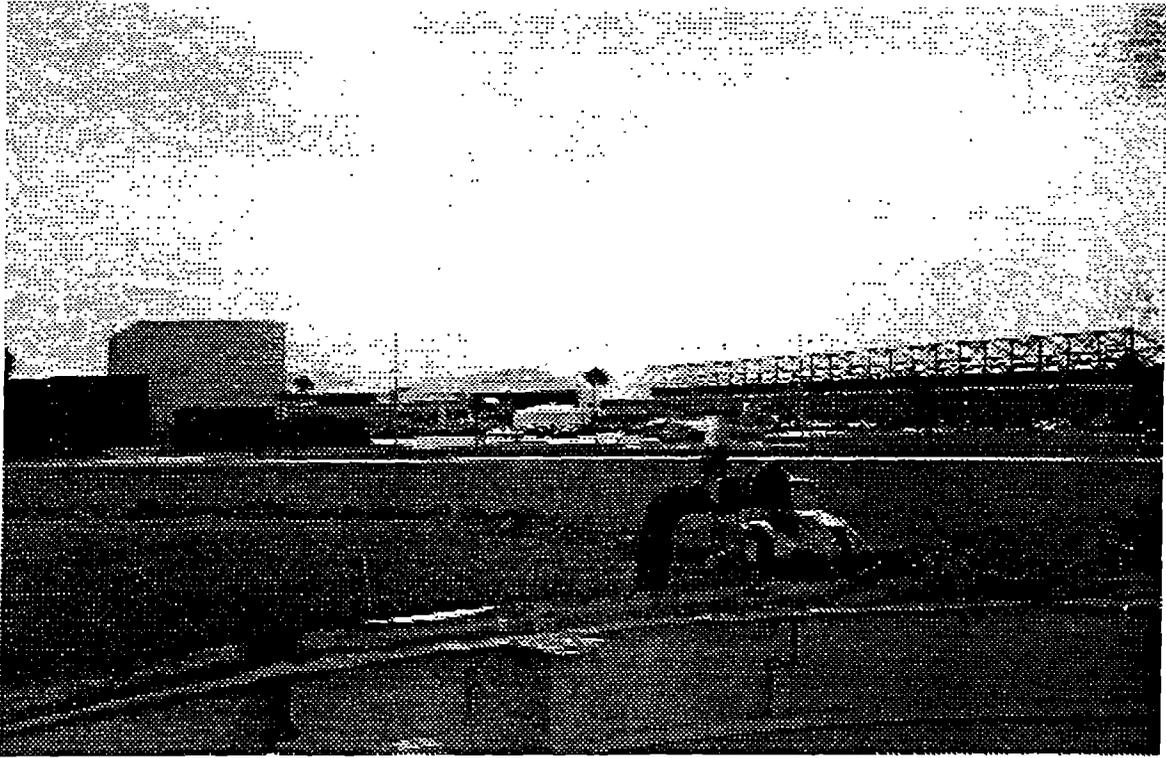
View of 10" piping over tank wall as well as piping trench in the background.
